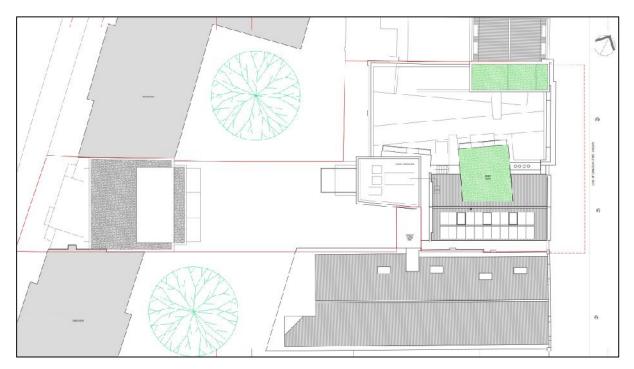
Proposed Roof Plan Showing Proposed Green Roof Location
